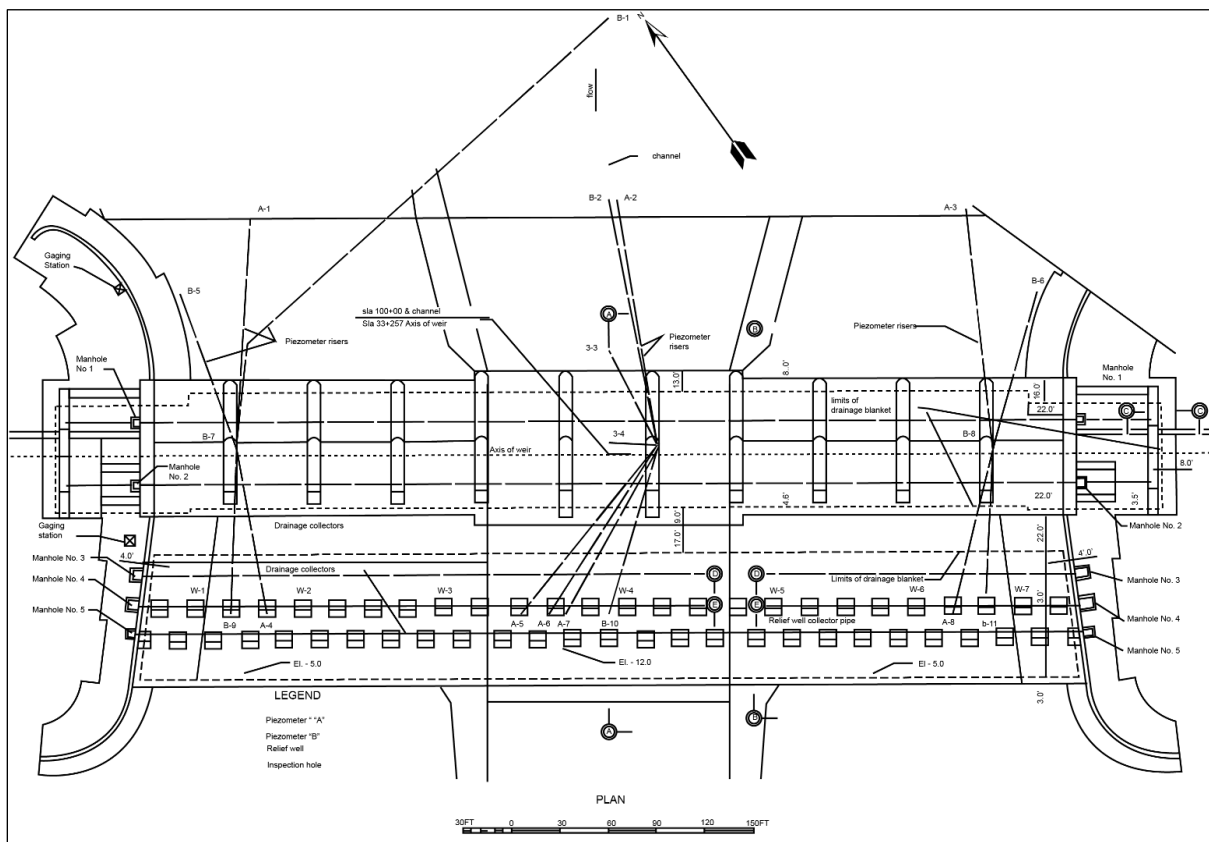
Plan of drainage system, relief wells, manholes, and piezometers (USACE 1962).
